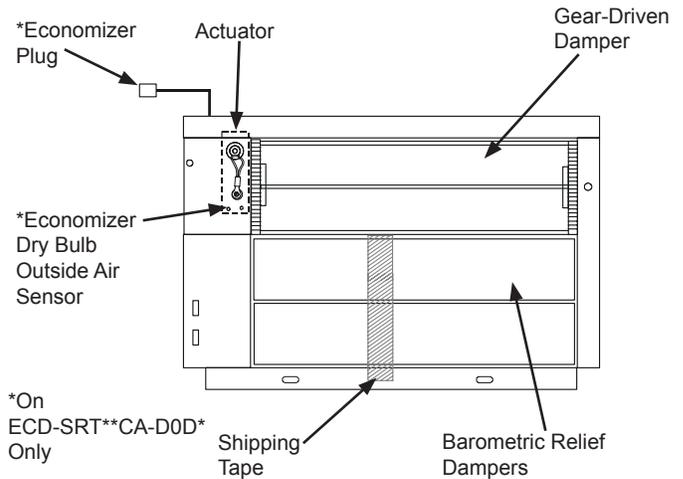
Economizer Component Locations — (Small Cabinet Economizer Shown)
